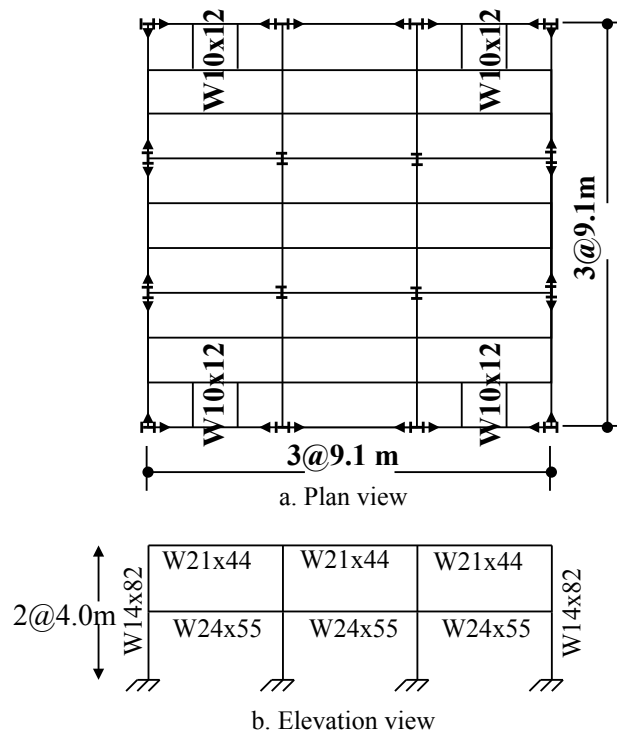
Plan view and elevation of the prototype steel office building designed in 1980s in California.
